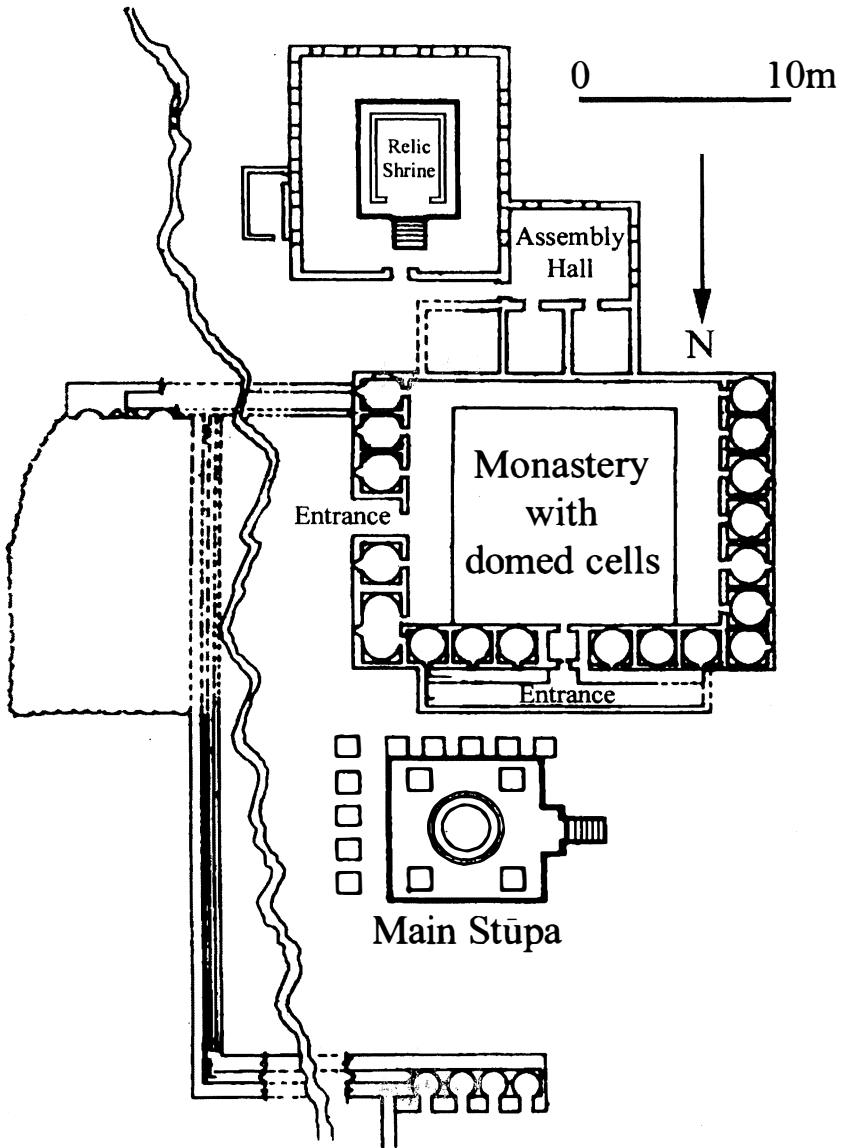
Plan of Tokar dara complex, Swāt (author's plan, modified after A.M. Khan).
